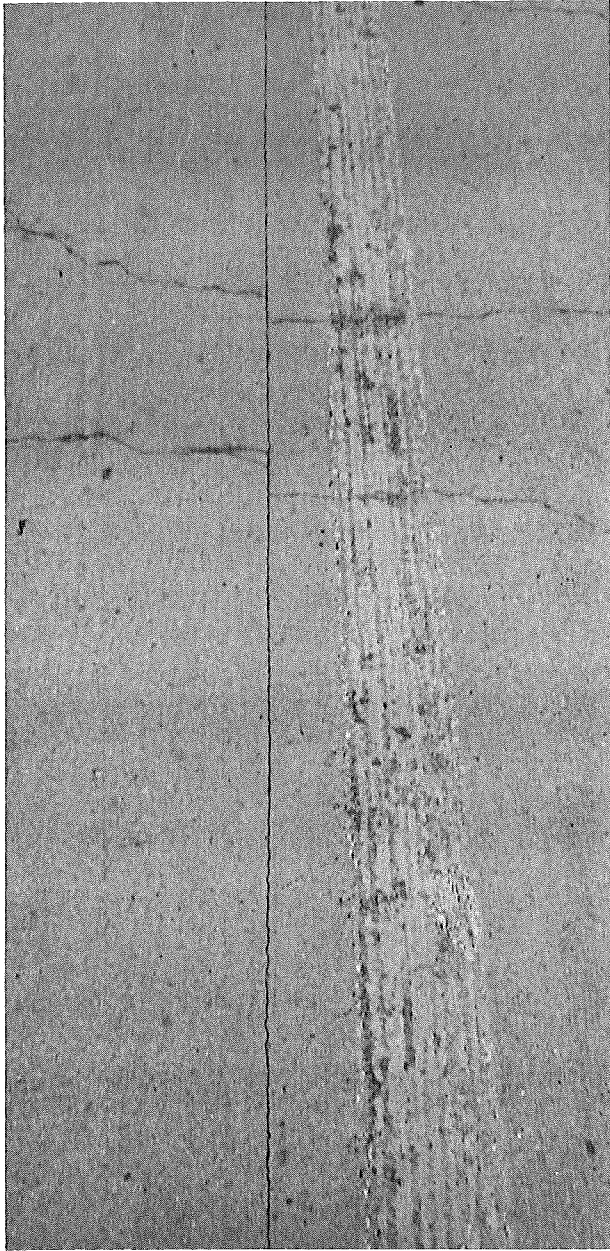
Neat appearing joint in continuously reinforced concrete pavement on I 80, Illinois.
